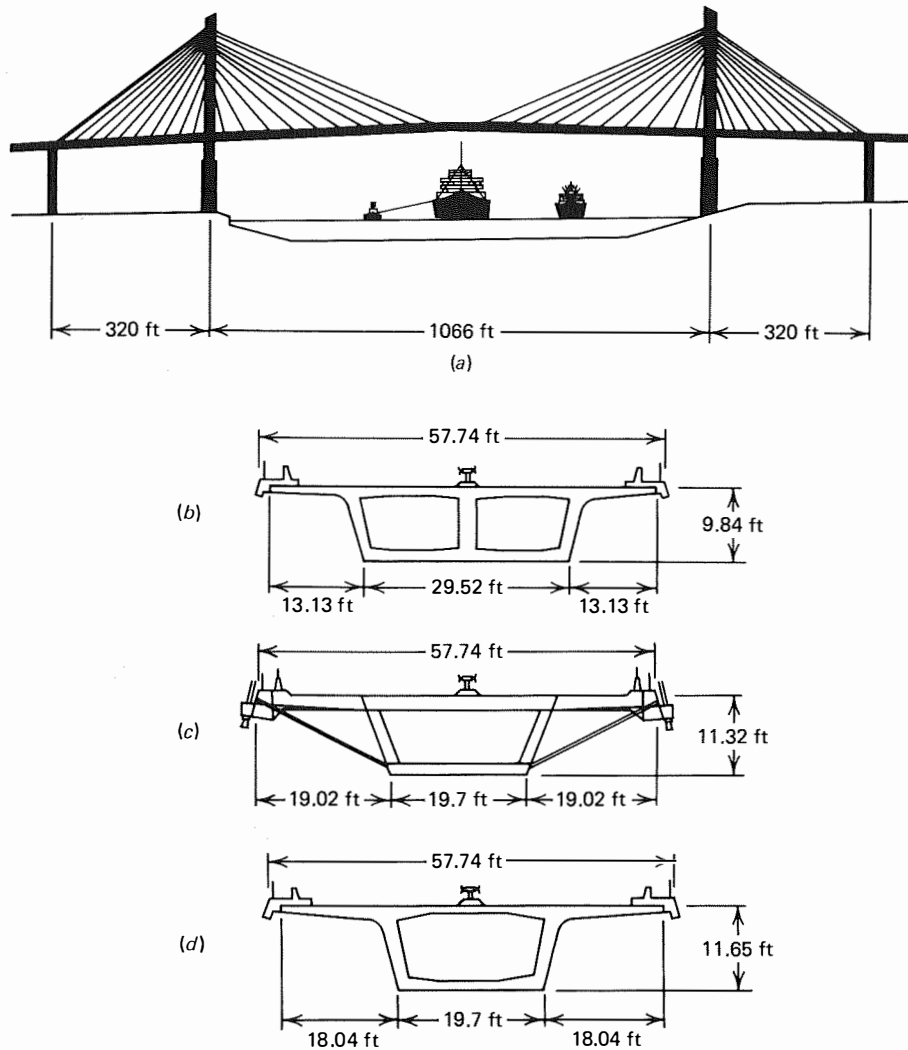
Nordbrücke Mannheim-Ludwigshafen: (a) elevation, (b) typical cross section, (c) cross section in the area of the sloping streetcar ramp, and (d) cross section at pylon (dimensions are given in meters.)
